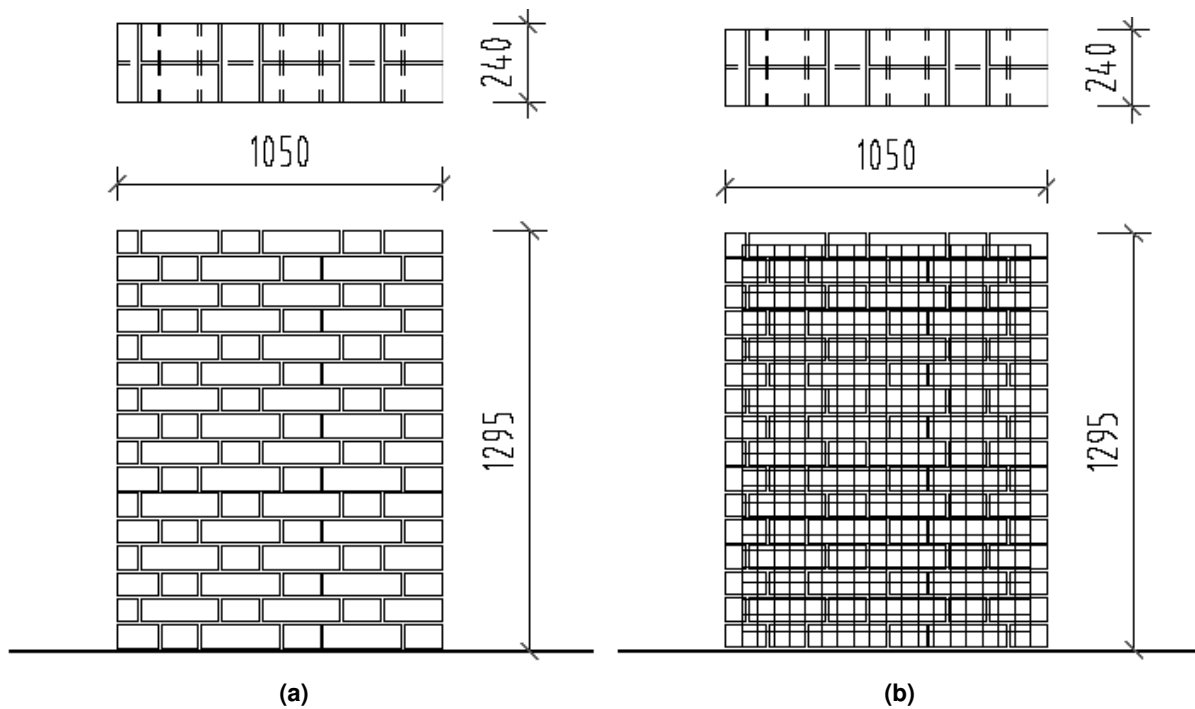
Overall dimensions of the masonry specimens and bricks arrangement (a) and position of the reinforcement grid (b).
